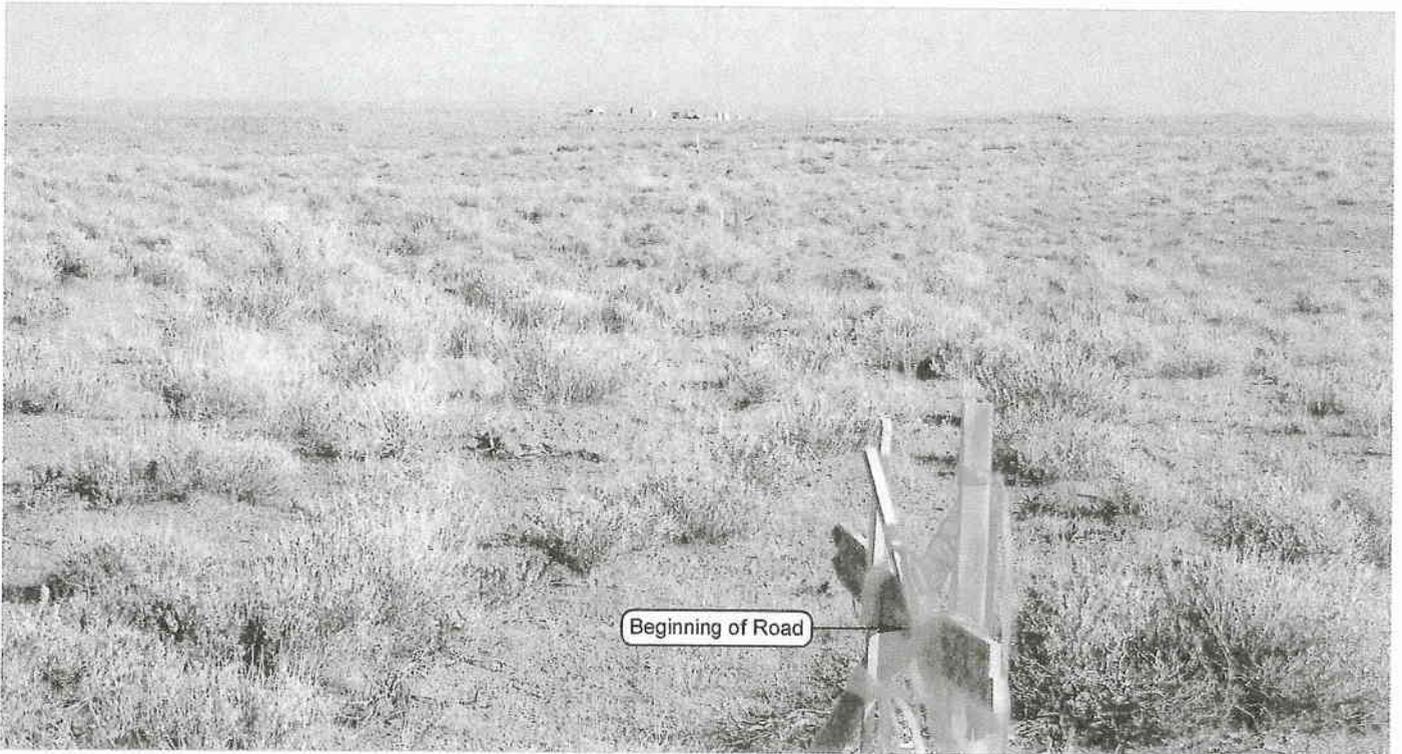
PHOTO VIEW: FROM BEGINNING OF PROPOSED ROAD
